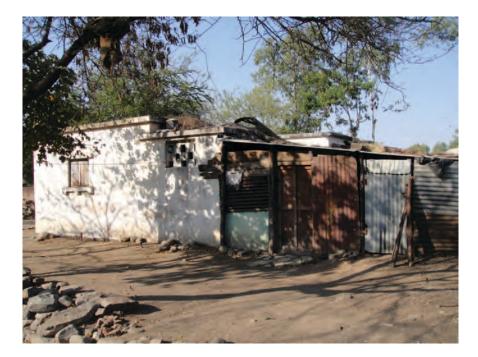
In many cases, people have used cheap corrugated tin sheets to make additions to their reconstructed houses.
